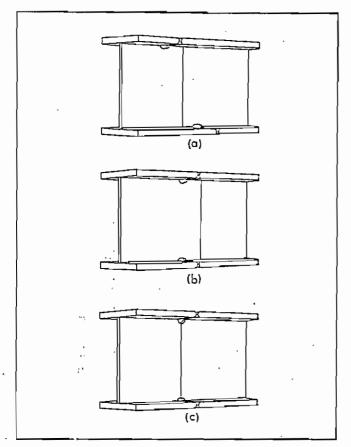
Three methods of preparing edges of girders for field welding. Placing the three welds in three different planes makes it difficult to get clase fit. It is easier to lay out all three butt welds in same plane. Placing two flange welds in the same plane and slightly offsetting the weld in the web offers a method af supporting one girder on the other during erection.
